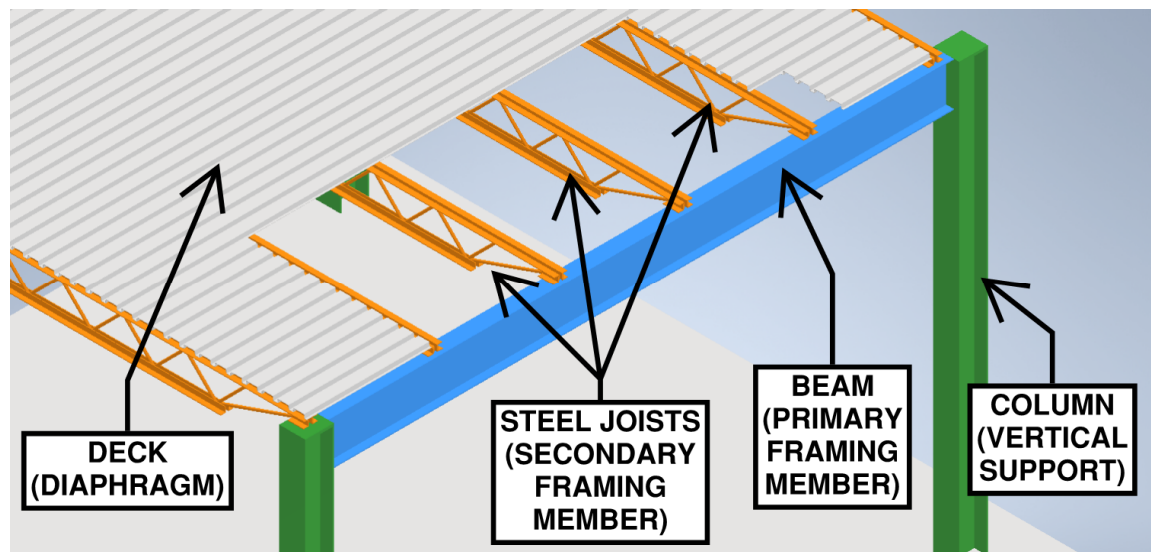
Conventional Steel Construction - Steel Deck, Steel Joists, and Wide Flange Beams and Columns
